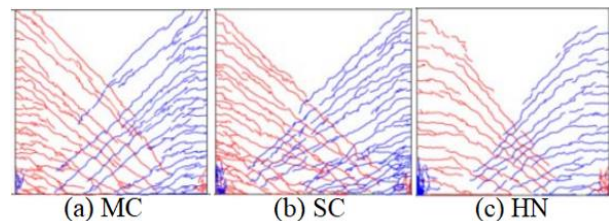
Crack pattern at peak load (schematic for lower-half of the specimens)
